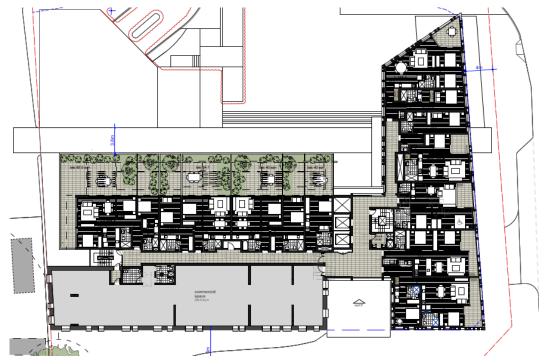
Approved Level 1 plan with commercial space (denoted as grey) and serviced apartments.
